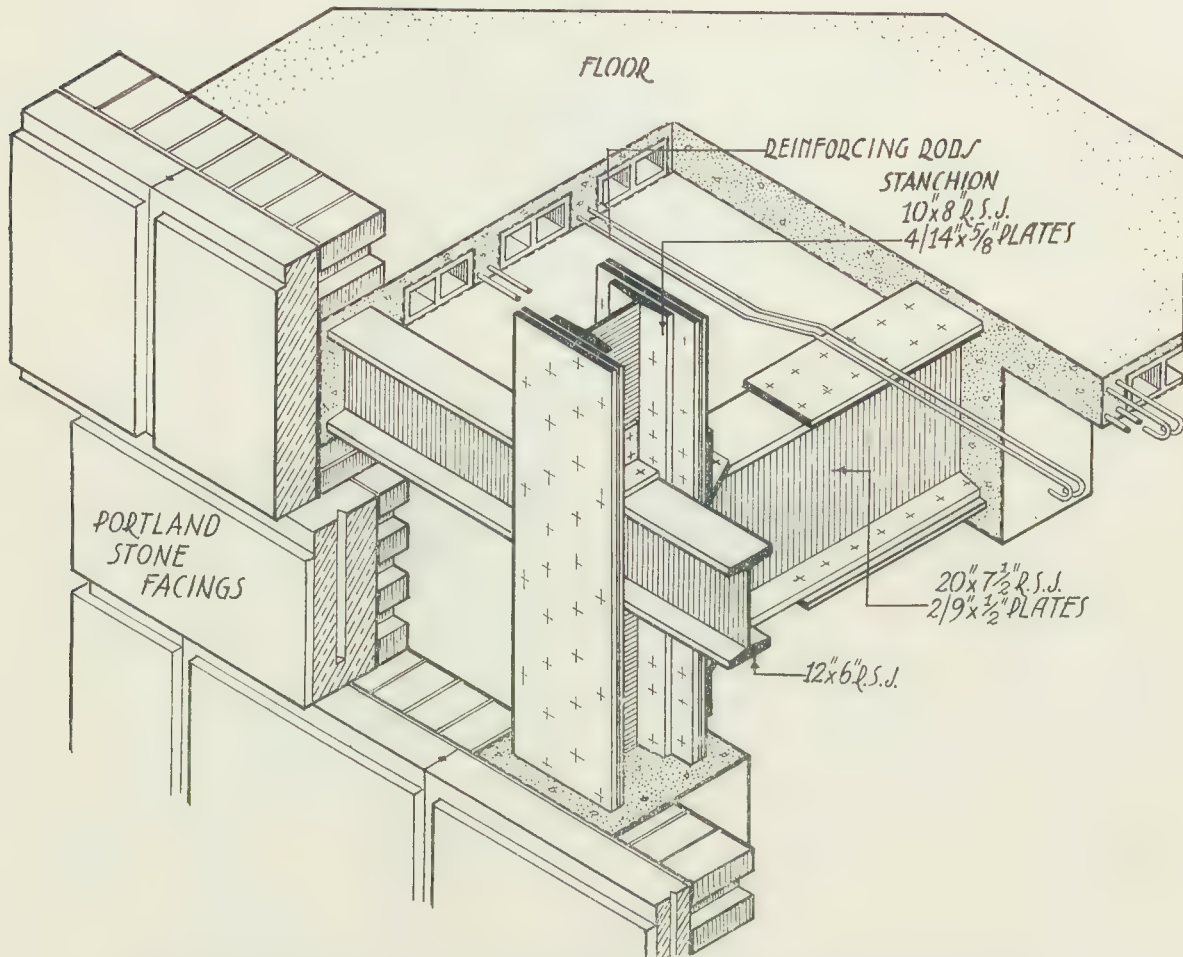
STONE-FACED WALL IN CONJUNCTION WITH A STEEL-FRAMED STRUCTURE
